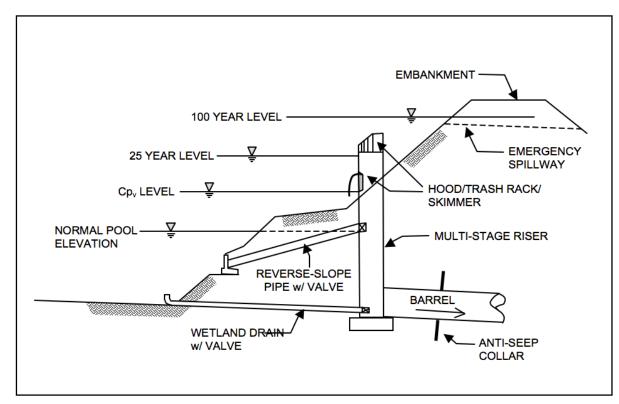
Typical Wetland Facility Outlet Structure
